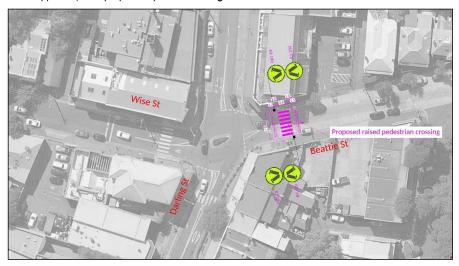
Darling Street / Wise Street / Beattie Street proposal.
